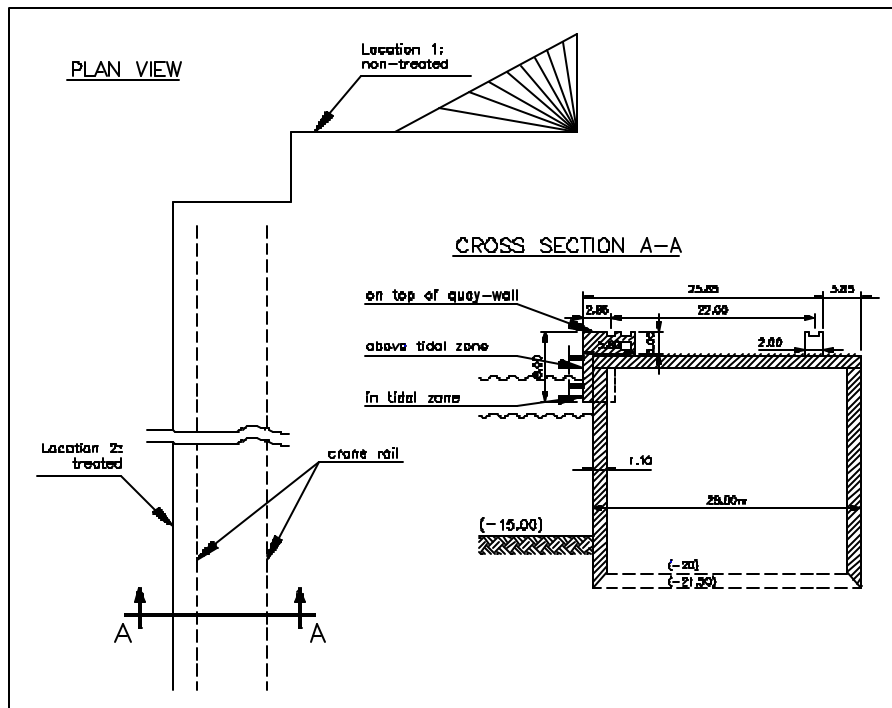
Plan view and cross-section of the quay-wall and locations of the cores
